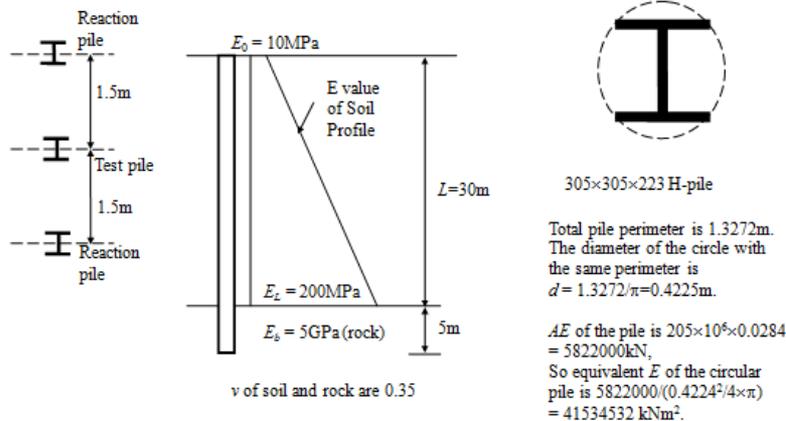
Worked Example HV-1 for a Tension Loading Test
